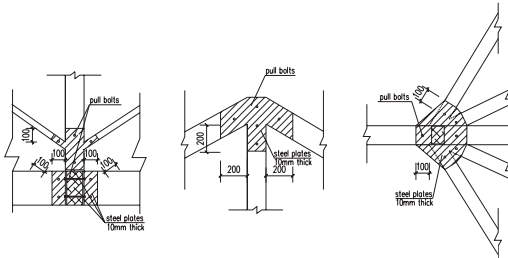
Diagram of strengthening middle joints of the wood roof truss.
